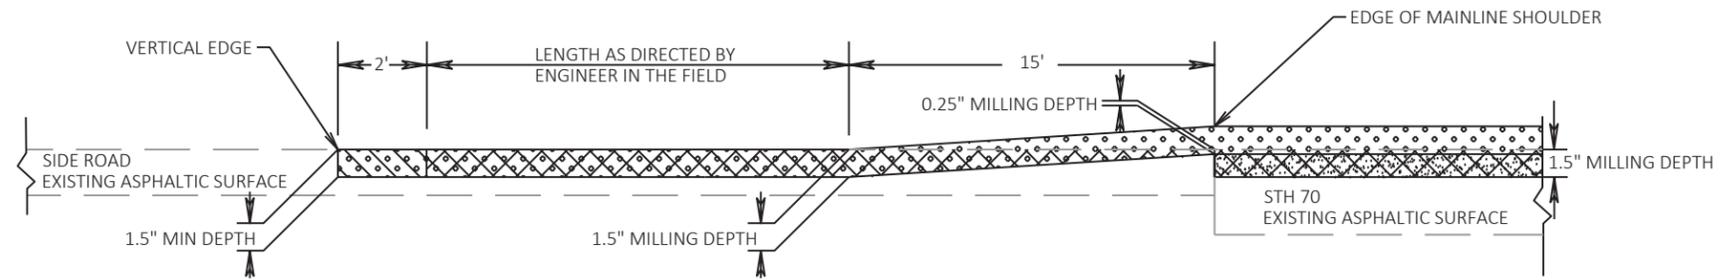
DETAIL FOR MAINLINE CONSTRUCTION JOINT
